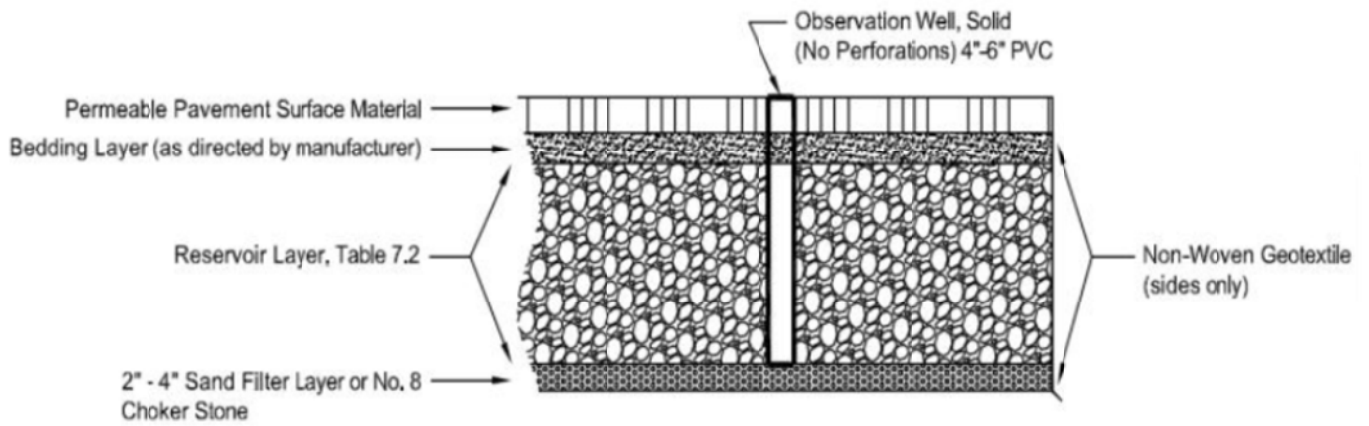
Typical Section Permeable Pavement Level 2 with Infiltration (Source: VADEQ, 2013)
